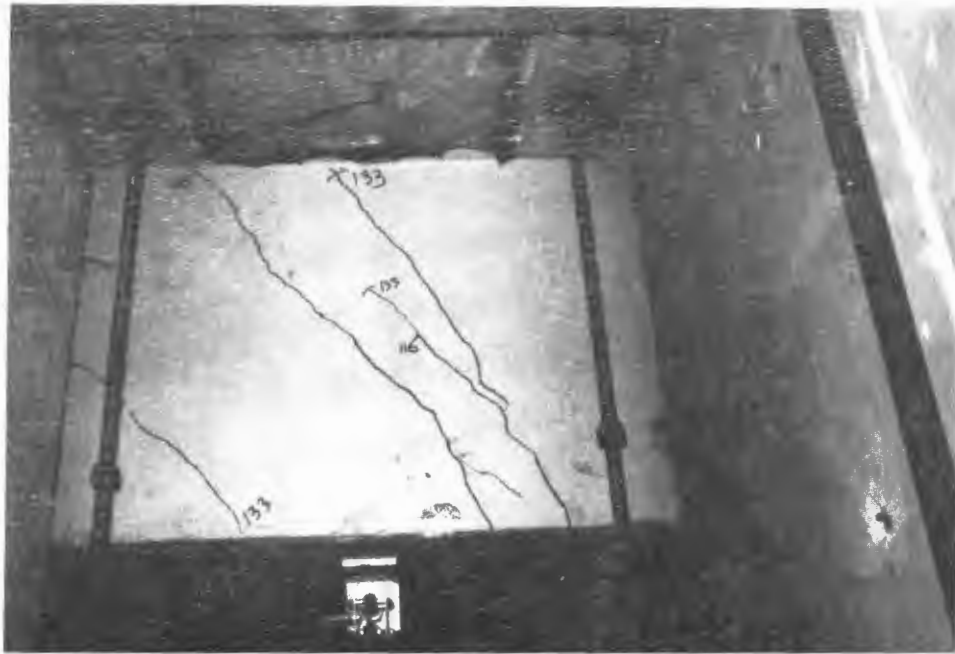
Crack Pattern of End Diaphragm - Girder 3 at
